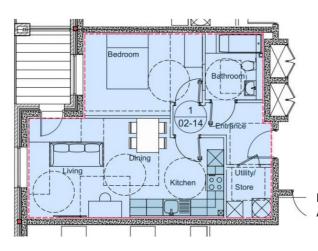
Typical 1 Bed Universal Design Apartment within Block 6
